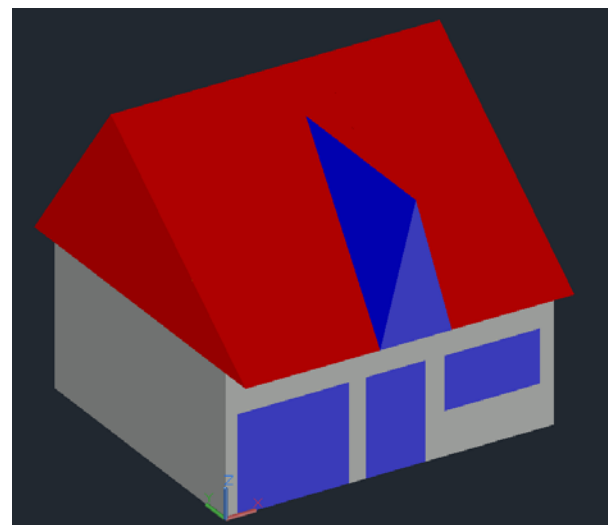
Virtual building equipped with a greenhouse located in the roof.
